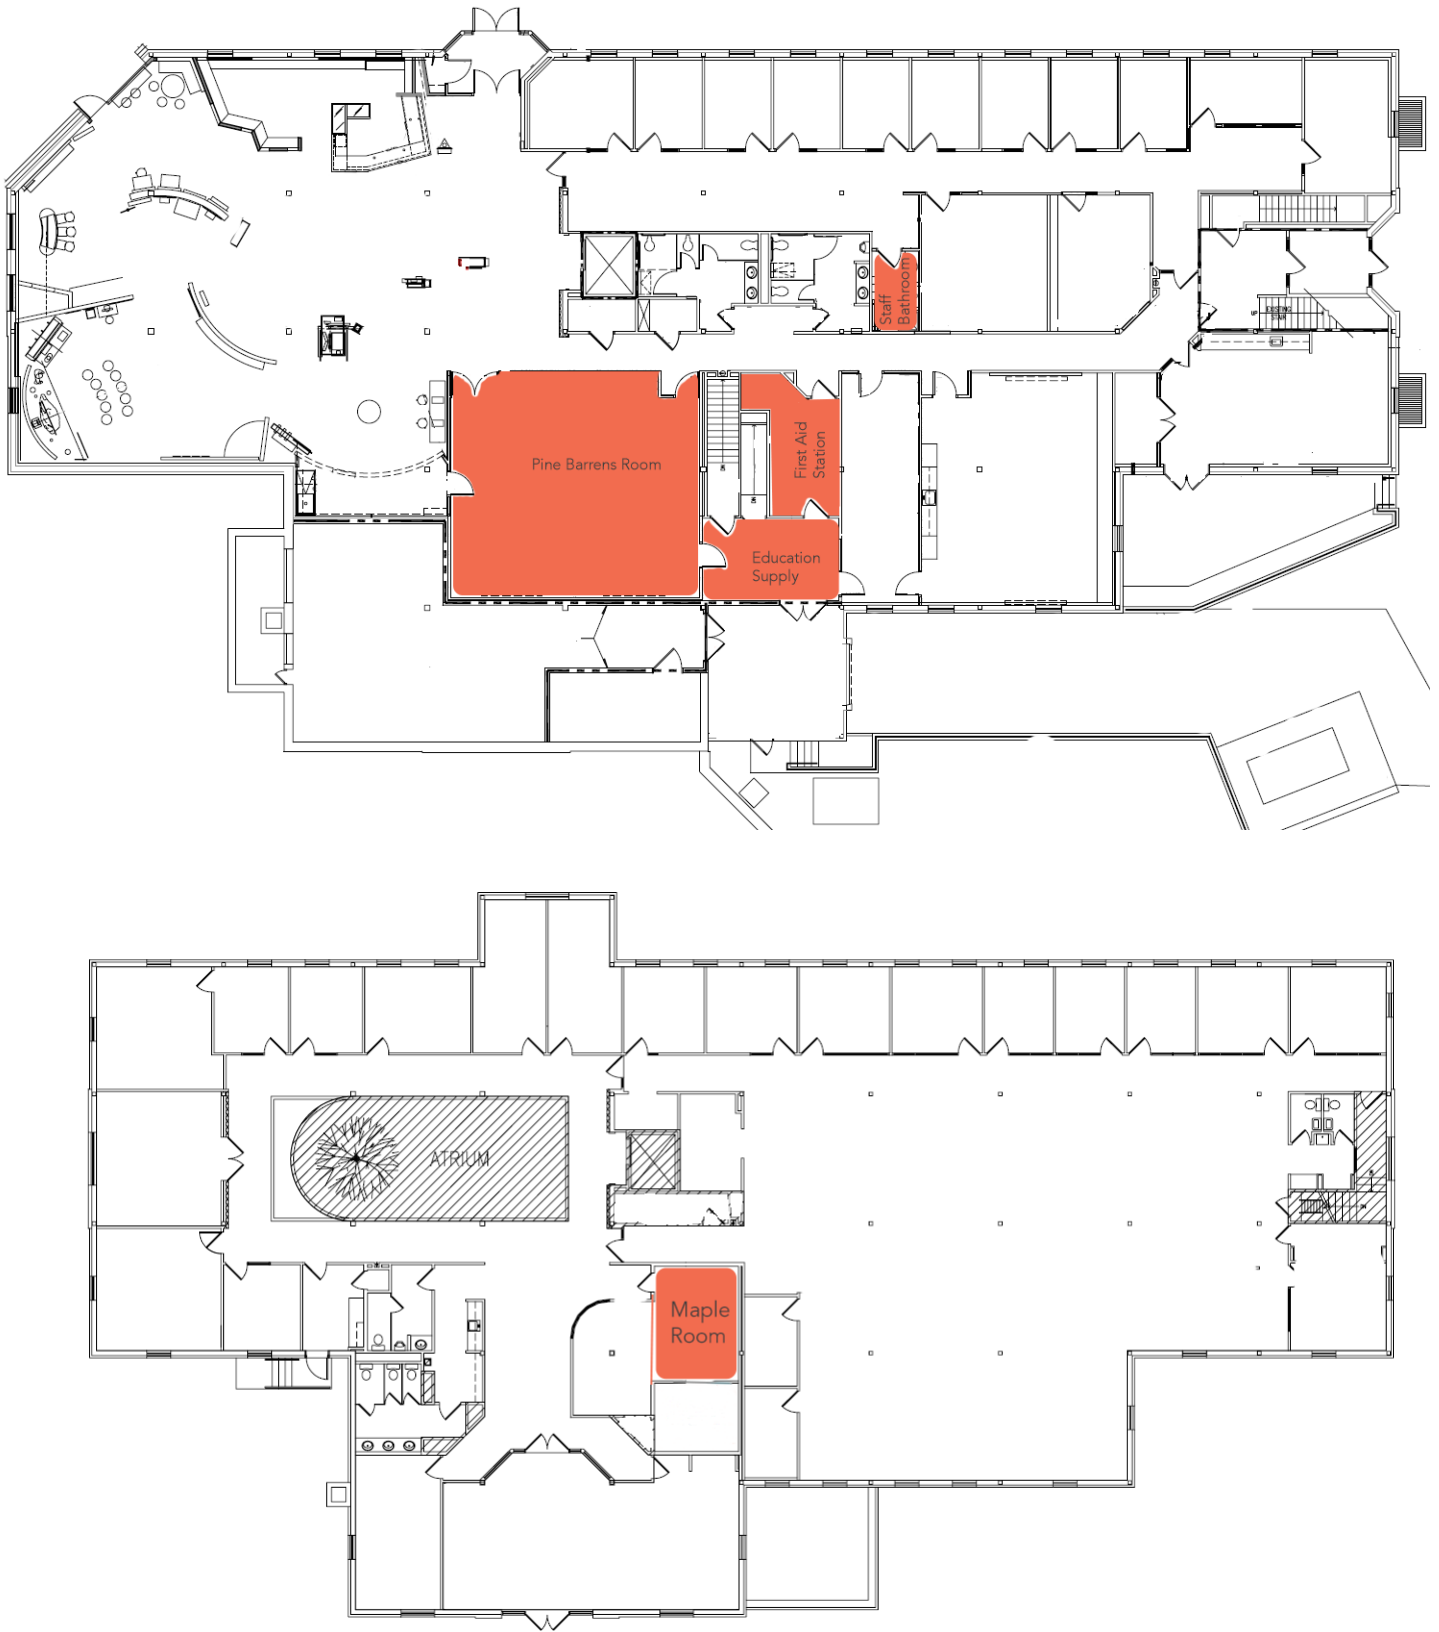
SHELTER IN PLACE LOCATIONS. THE TOP IMAGE IS OF THE FIRST FLOOR AND THE BOTTOM IMAGE IS OF THE SECOND FLOOR.
